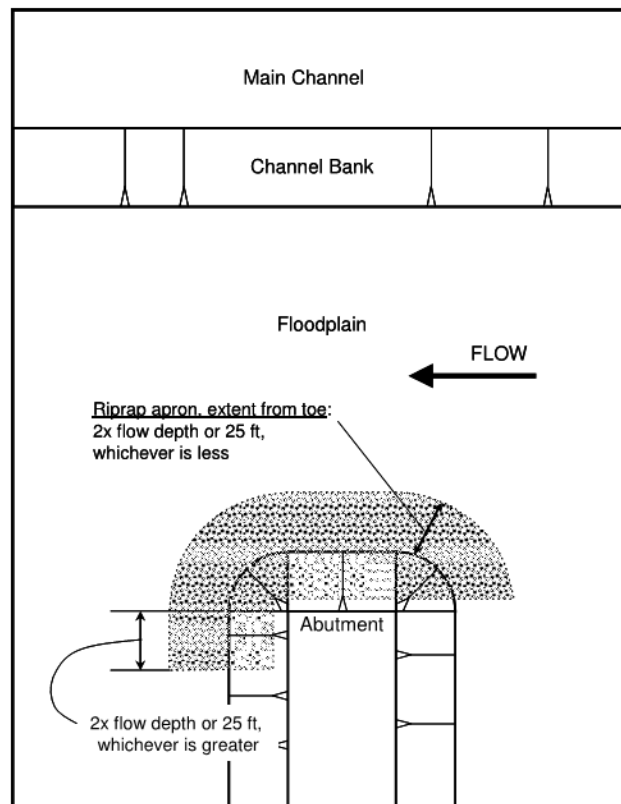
Plan view of the extent of rock riprap apron (Lagasse et al. 2006).
